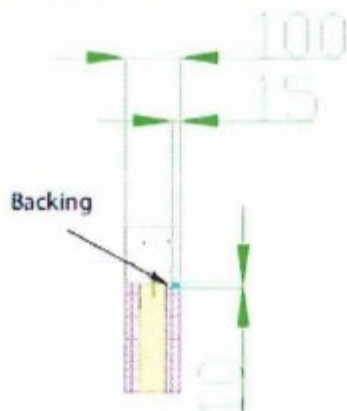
wall gypsum to stone thickness ≥ 100 mm
